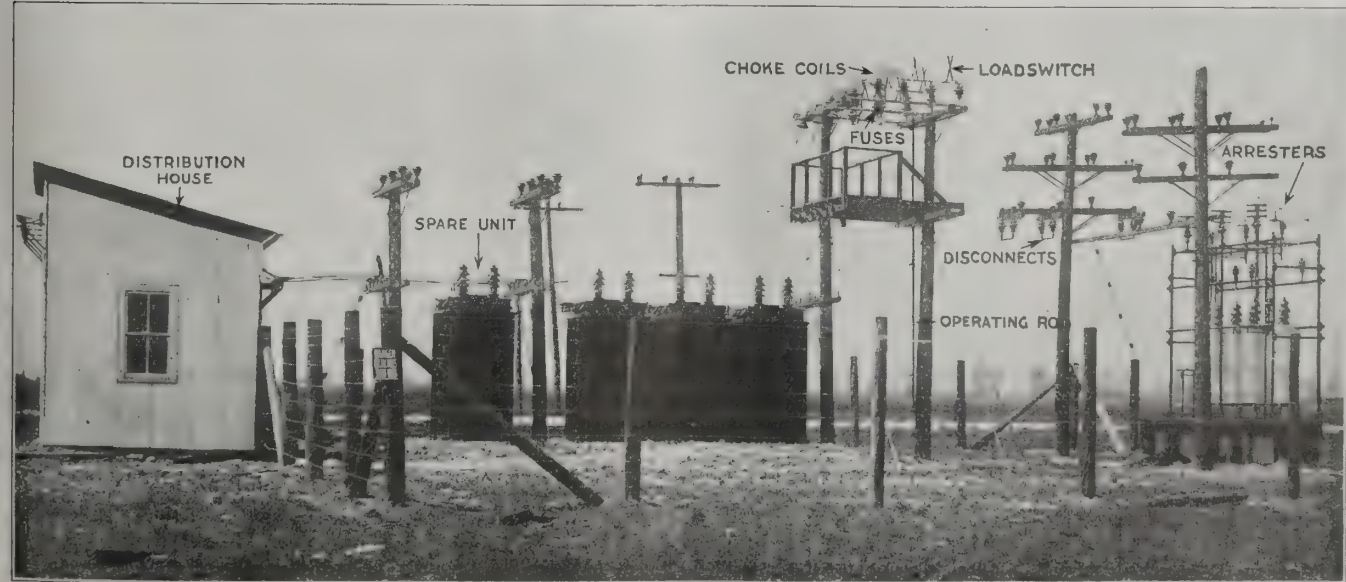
COMPLETE OUTDOOR SUBSTATION
